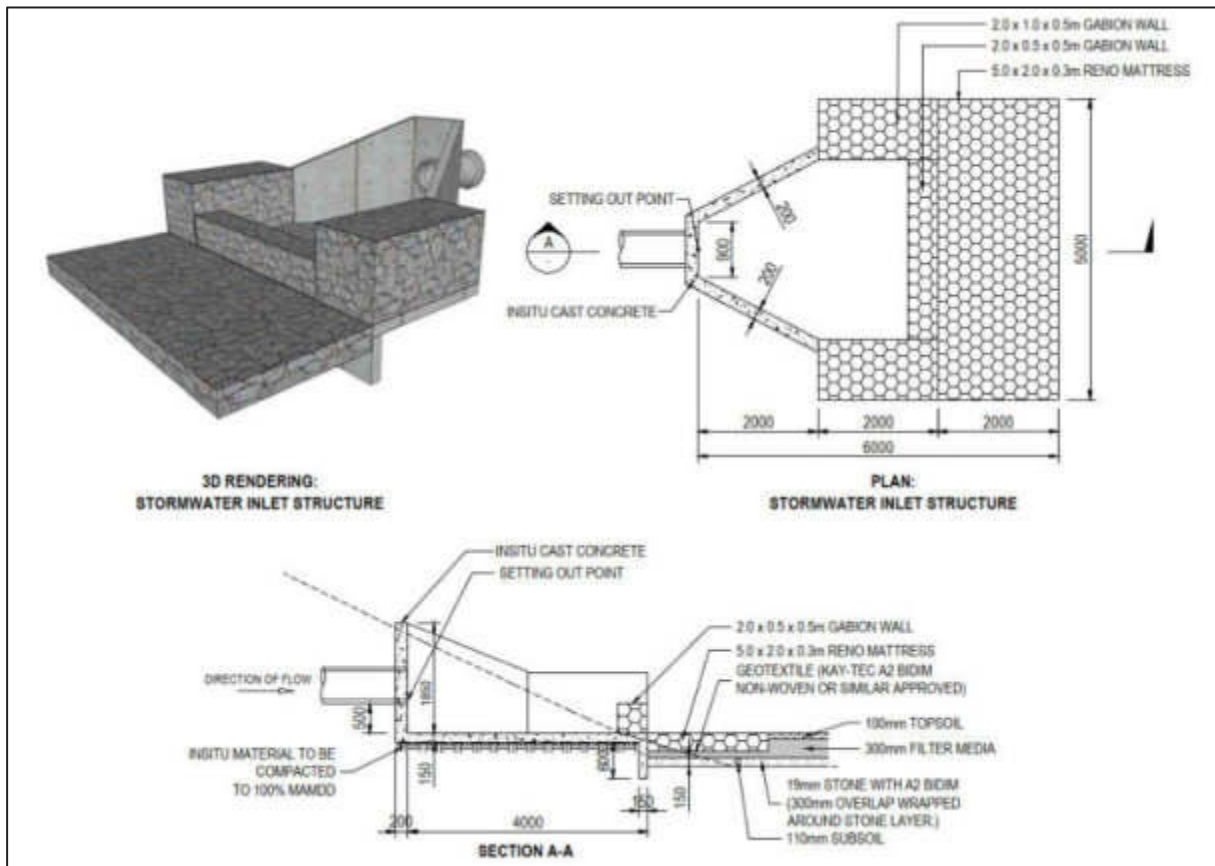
Wet Detention Pond – Typical Pond Inlet Structure
